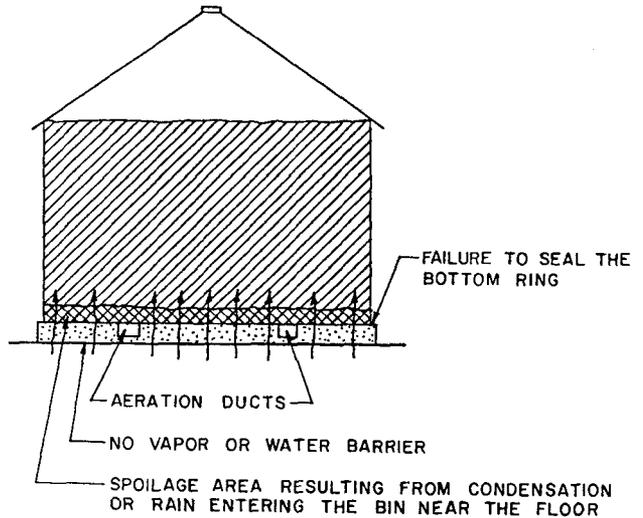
A sheet of plastic should be placed under the concrete floor during bin construction to serve as a vapor and water barrier and prevent the rewetting of grain.
